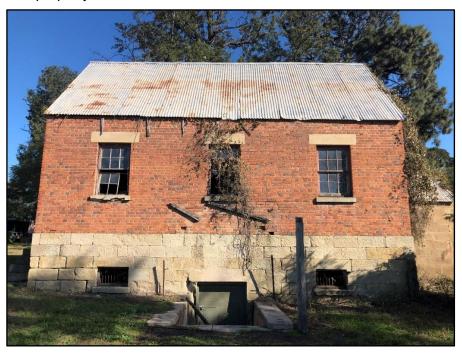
Archerfield brick outbuilding – east facade (2020)
